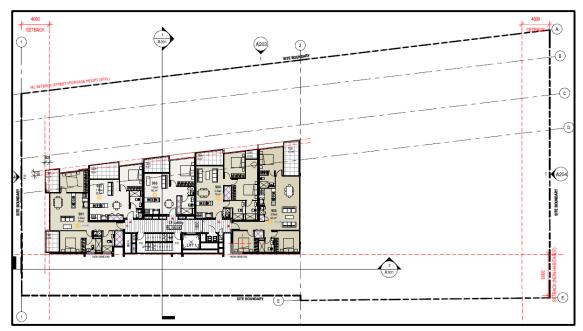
Proposed Level 9 Plan (*Source: Brewster Murray)
